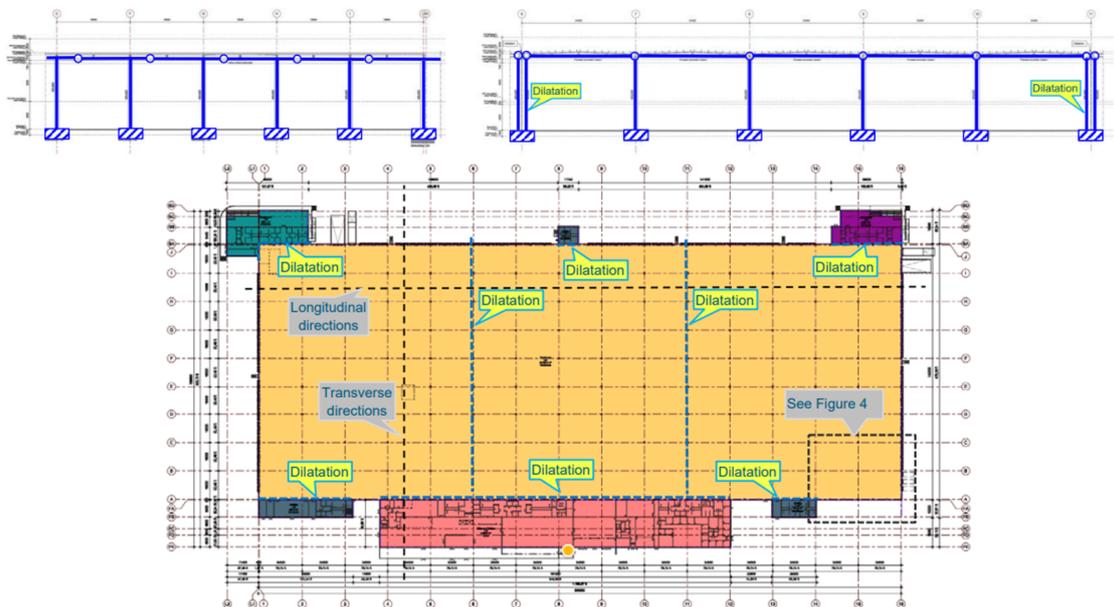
Typical sections of the concrete (IXD) warehouse with stabilising portal frames in the transverse (top left) and longitudinal (top right) directions, and general layout (bottom) (RHDHV Internal Document, 2020)
